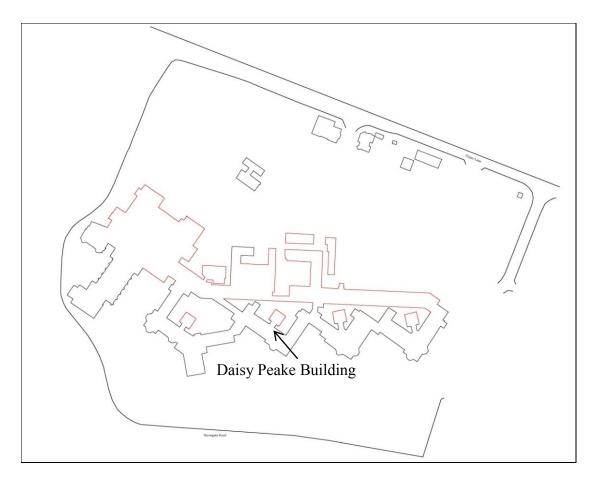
Site plan, with buildings proposed for demolition outlined in red (Level 3 survey) and building proposed for alteration outlined in black (Level 2 survey). Derived from plan supplied by client, not to scale. North to top of plan.
